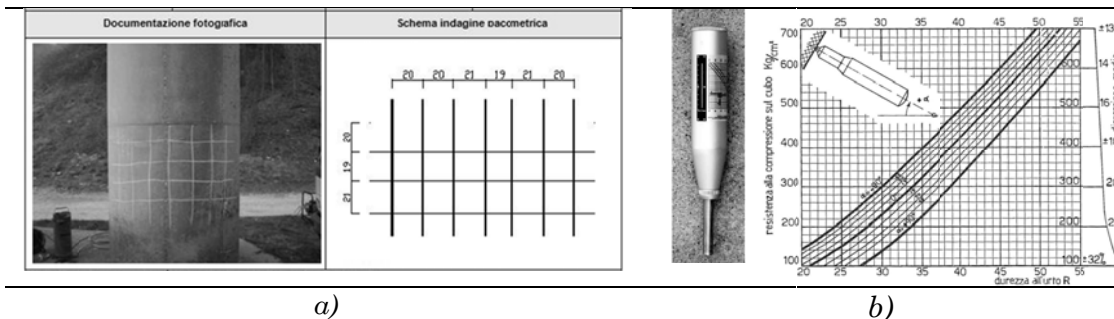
On site tests on rc bridges: a) pachometer test, b) sclerometric test
